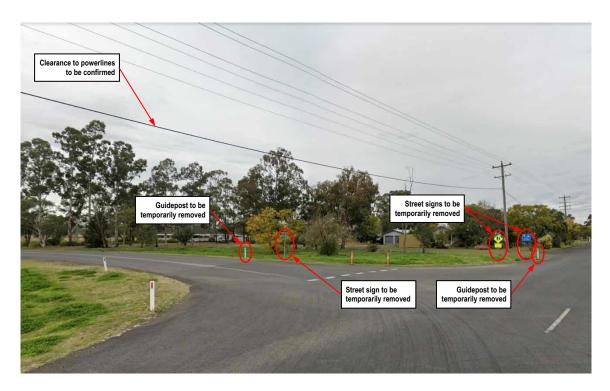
Dalby Jandowae Road / MacAlister Bell Road Intersection (Location 10) Looking East
